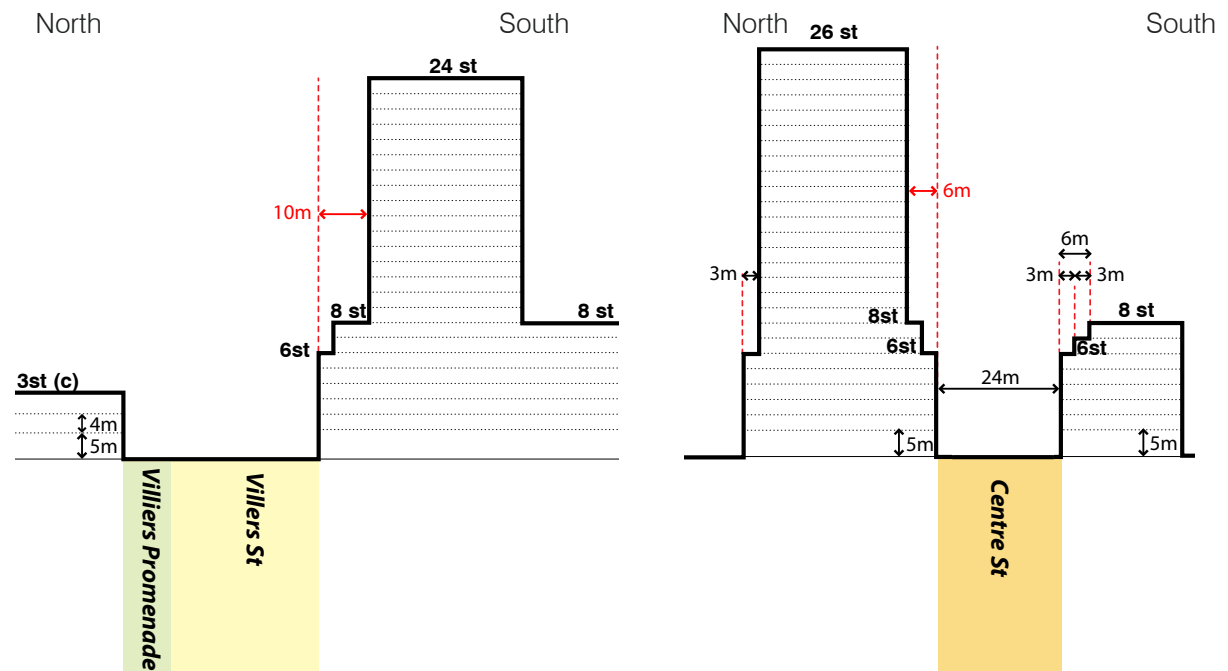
Section diagrams illustrating the tall building setbacks from Villiers Street and from Centre Street
